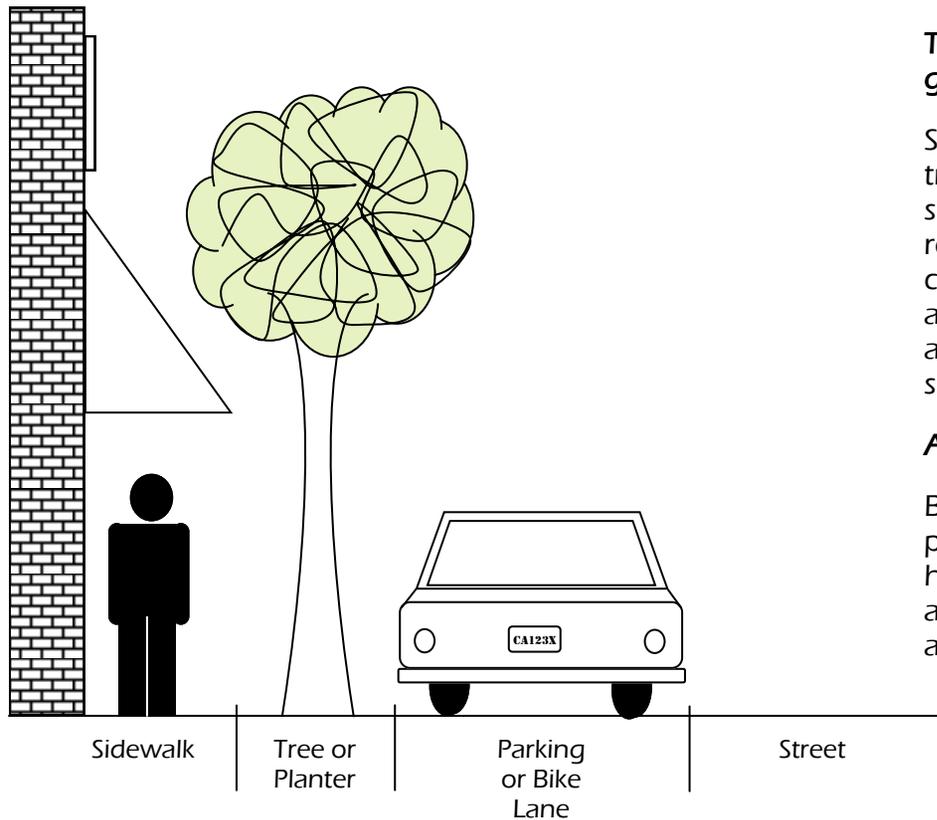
Street cross section with tree/ planting and parking buffer zones.
